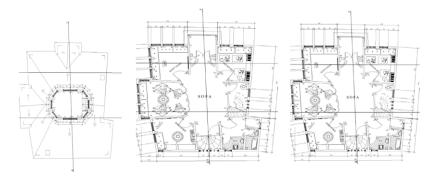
Fenerli House's Cihannum floor plan, ground floor and first floor plan
